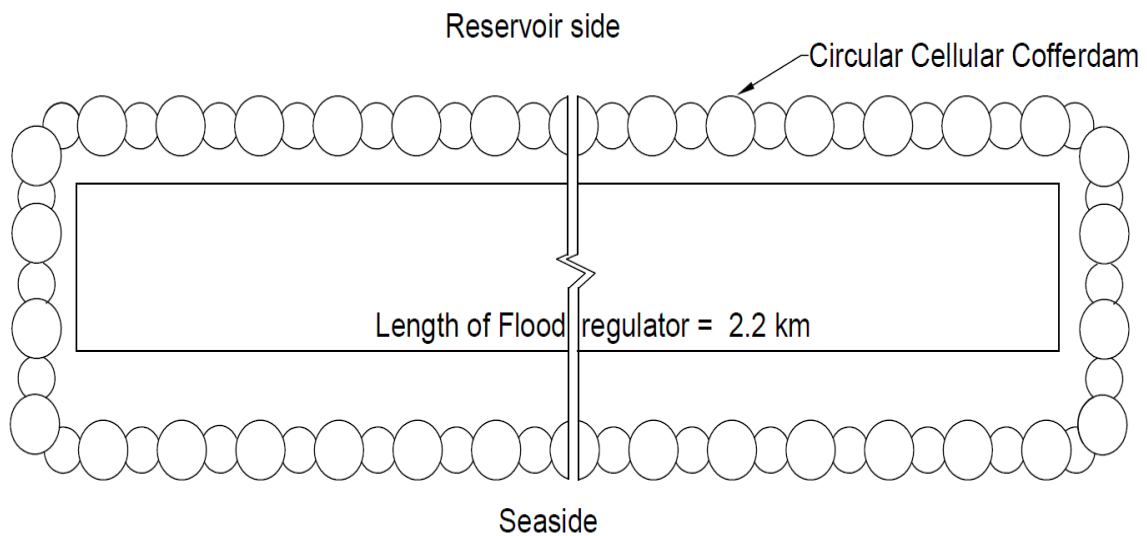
Plan showing Cofferdam around Flood Regulator
